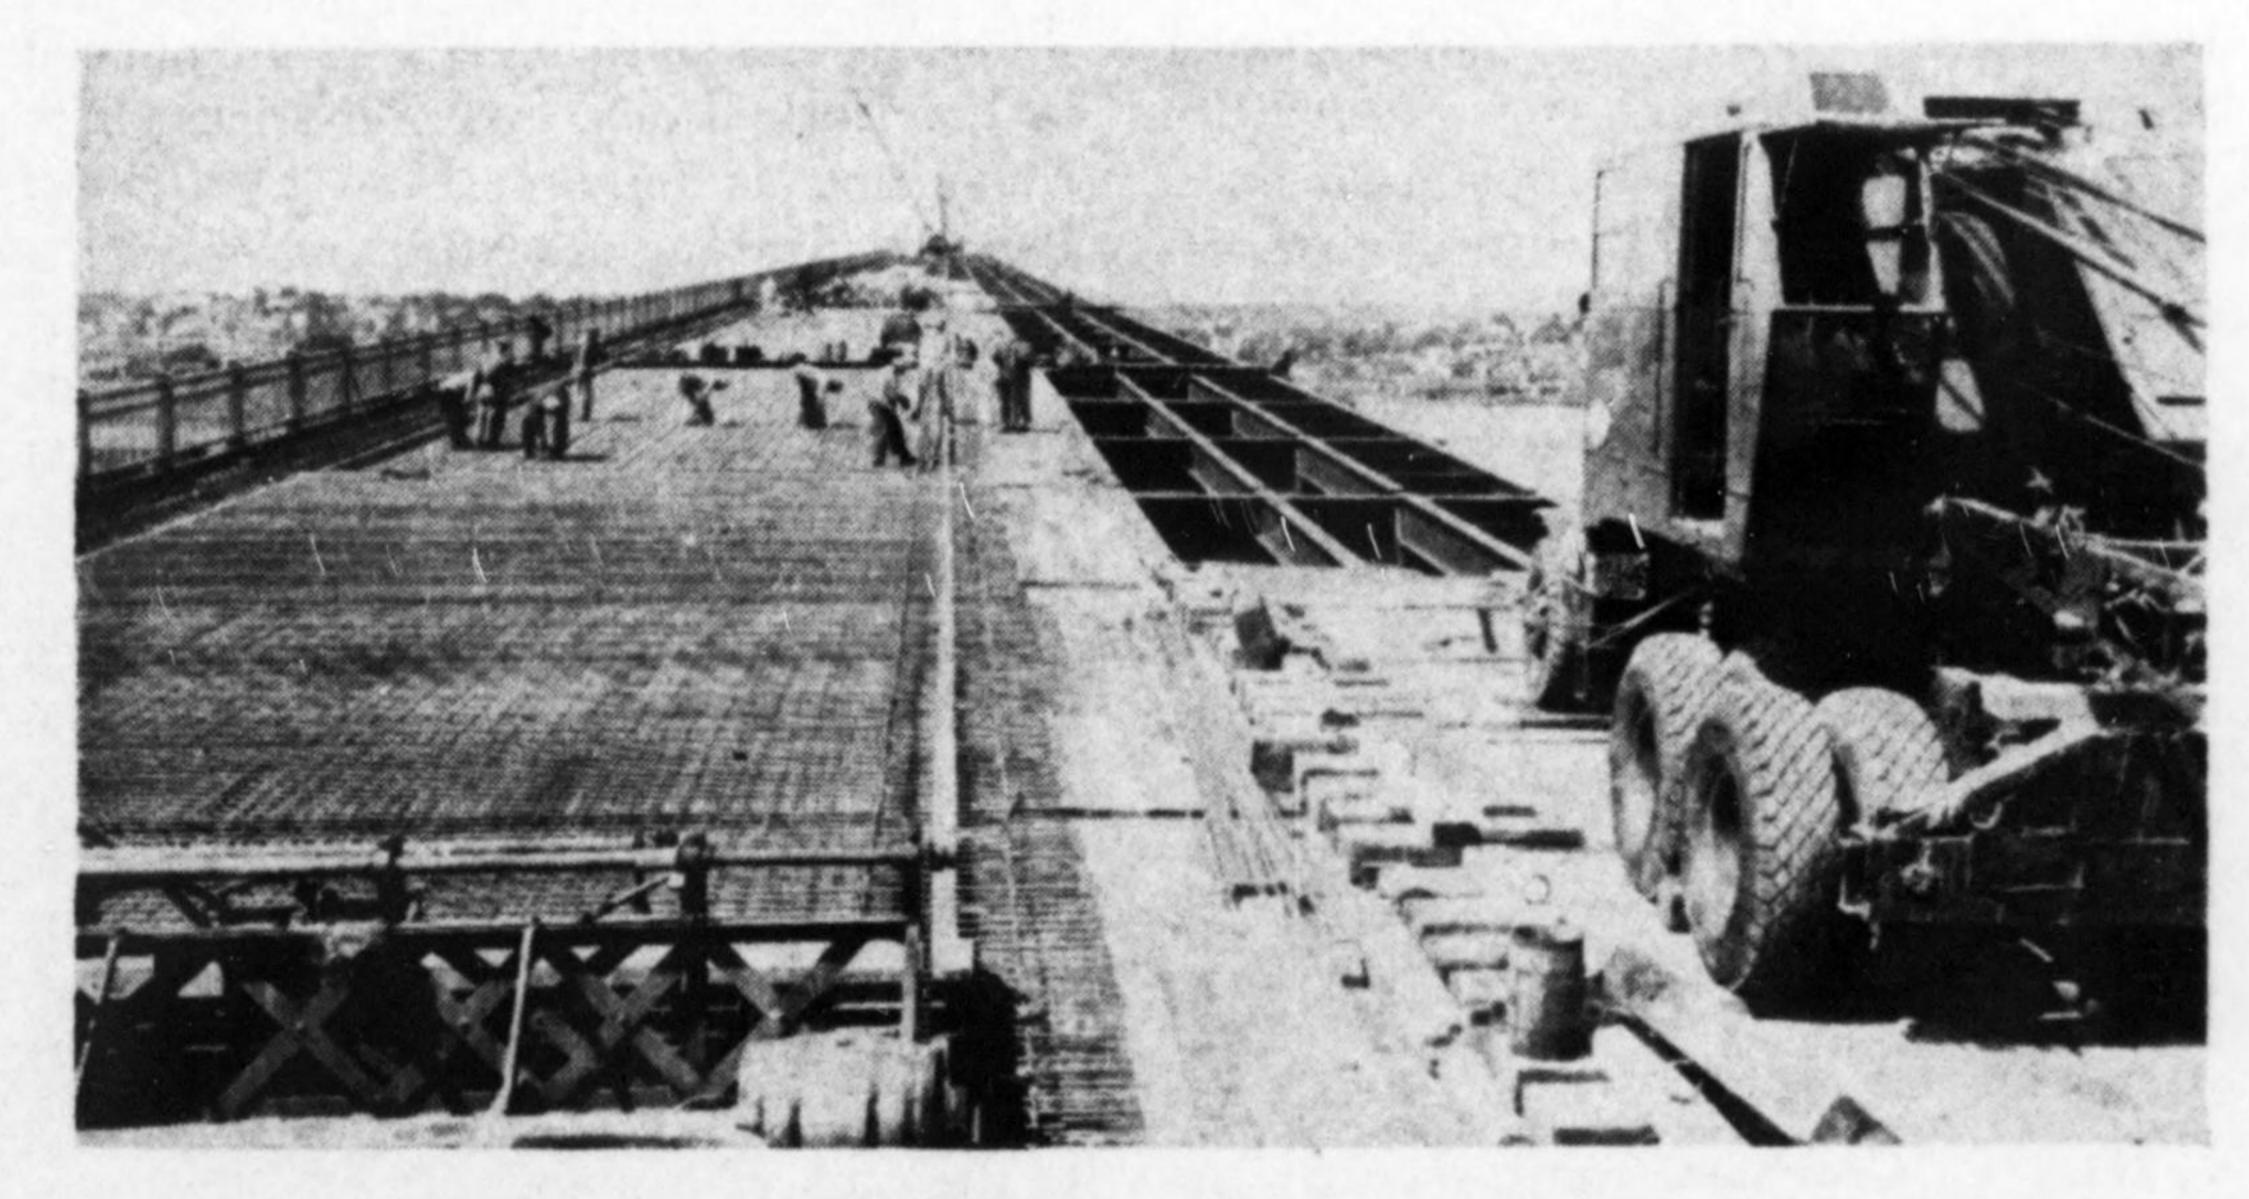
Forms for the 7¾-in. thick concrete deck were carried on kneebraces supported on the lower flanges of the stringers. Approach concrete, supplied by a paver at ground level, was raised and placed by a truck crane. Truck-mounted mixers delivered most of the concrete for the central sections, a crane and bucket being used where trucking was prohibited.
